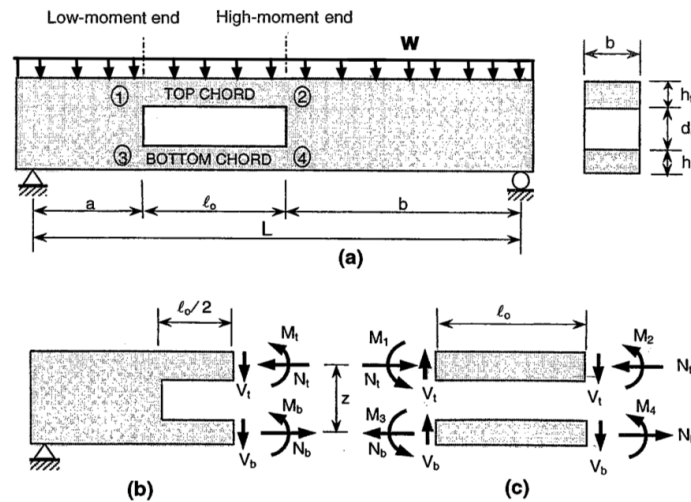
Beam Subjected to Shear and Bending. (a) Typical Beam with Opening, (b) Loadings on the Opening Segment, (c) Loadings on the Chords
